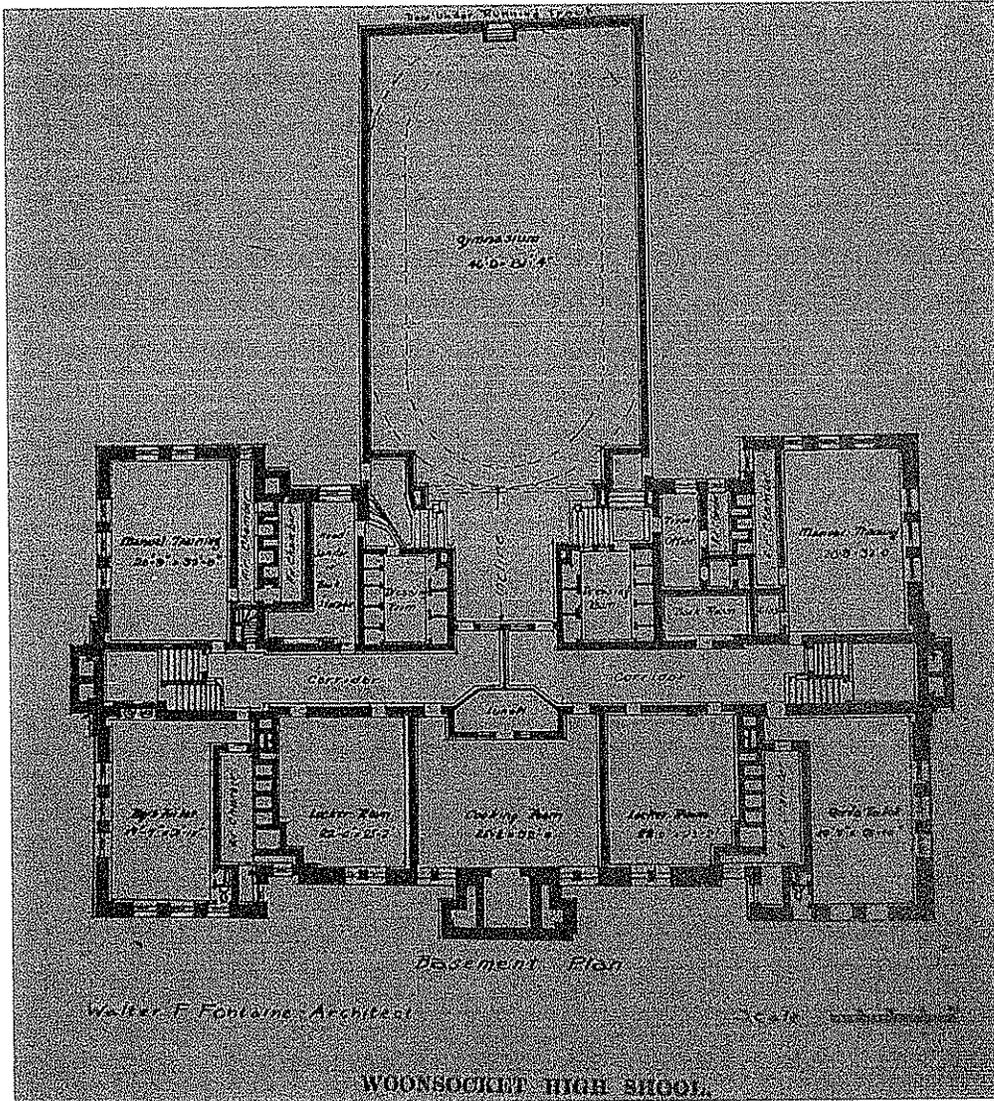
1914 Senior High School floor plan (source: WSCC 1915).
